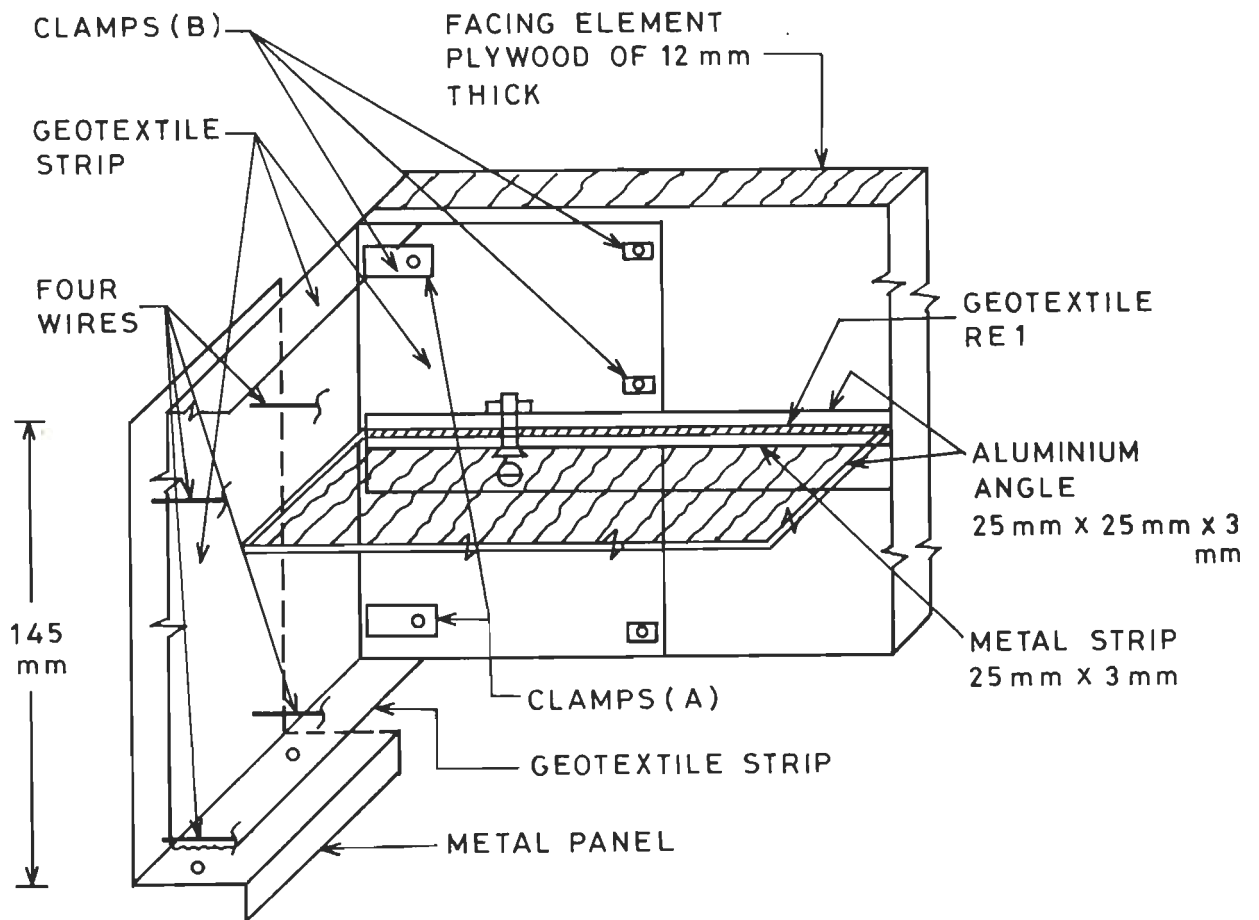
DETAILS OF CONNECTIONS BETWEEN THE SOIL REINFORCEMENT, GEOTEXTILE STRIPS COVERING TRANSVERSE SIDE AND THE FACING ELEMENT.
